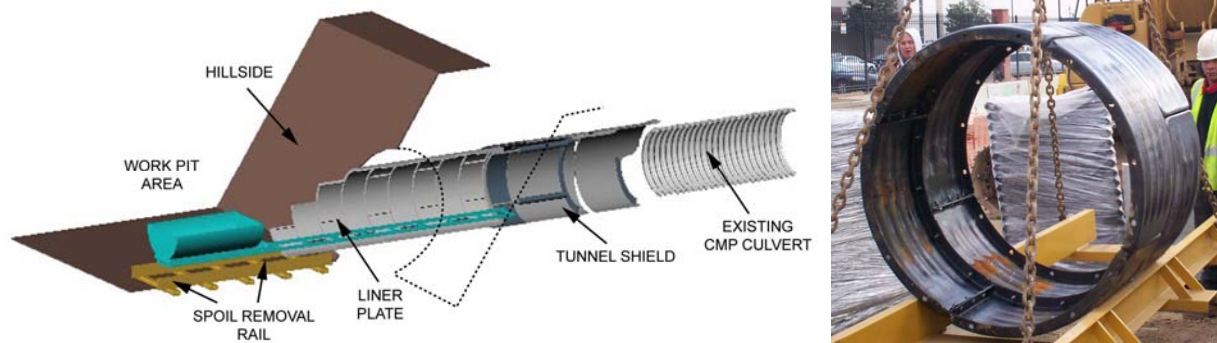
Liner plate is used during the tunneling process to consume an existing culvert (Tenbusch, 2009): tunnel with liner plate illustration (left); assembled liner plate ring (right).
